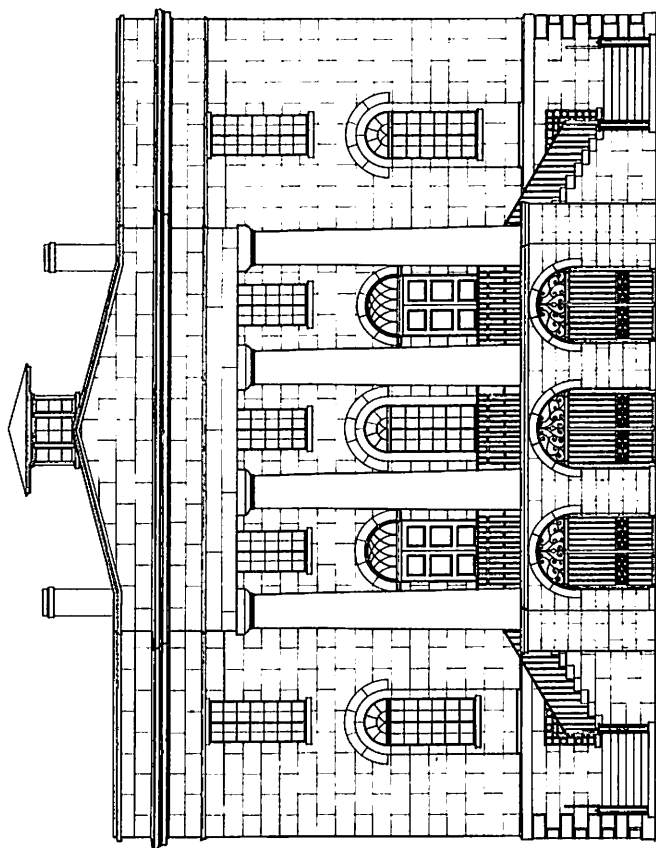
"County Records Building." South elevation of the Fireproof Building (by M. Benoit Halsey, HABS, 1934).
